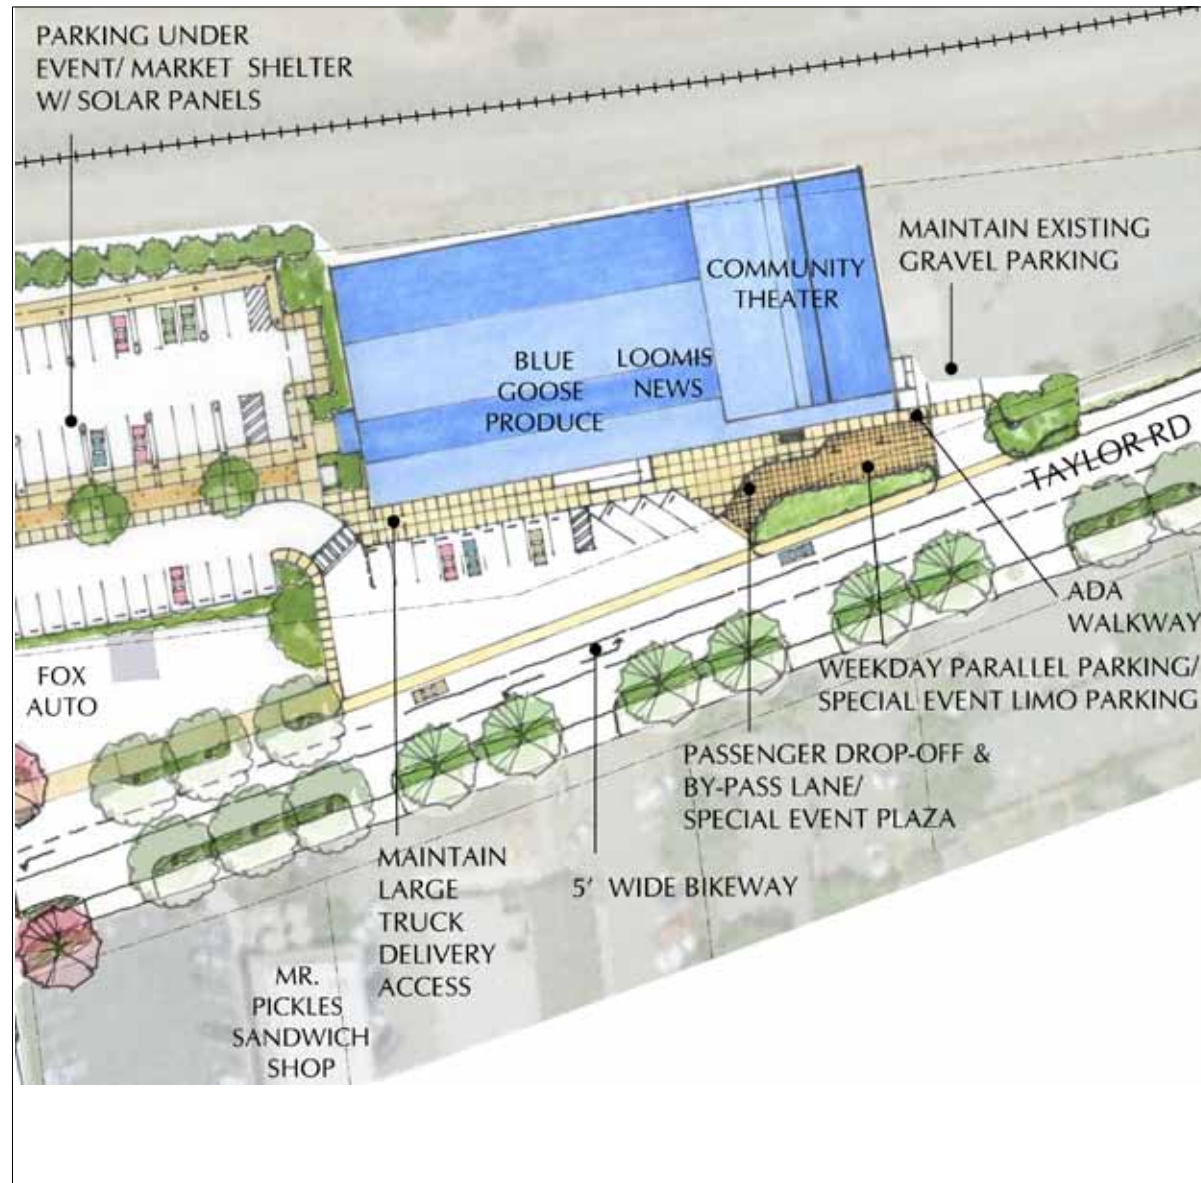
TOWN CENTER EAST STREETScape CONCEPT PLAN
